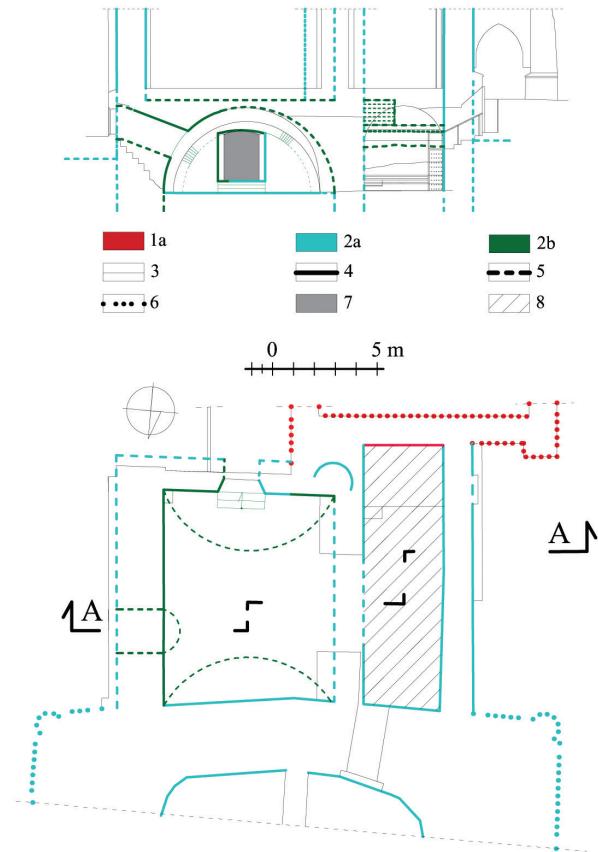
Reconstruction of the plan and cross-section through the monastery crypt of stage 2 of phase b. Markings: 1a – 1st half of the 14th century, 2a – approx. 1730, 2b – approx. 1731, 3 – current state, 4 – visible course of basement walls, 5 – invisible course of walls below ground level, 6 – ground floor walls, 7 – passageway, 8 – part without basement (elaborated by A. Piwek, M. Kwasek)
